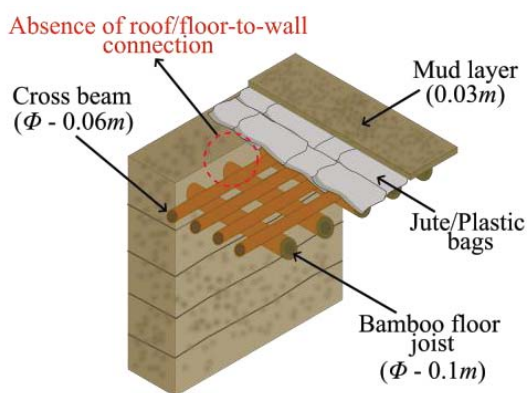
Typical sketch of the floor/roof system in rammed earth buildings
